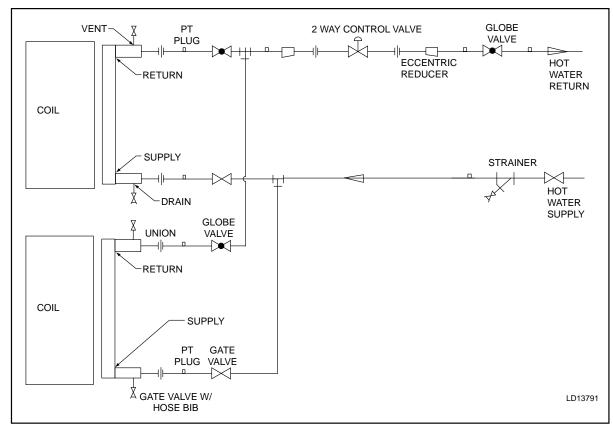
HOT WATER PIPING - 2 WAY VALVE
